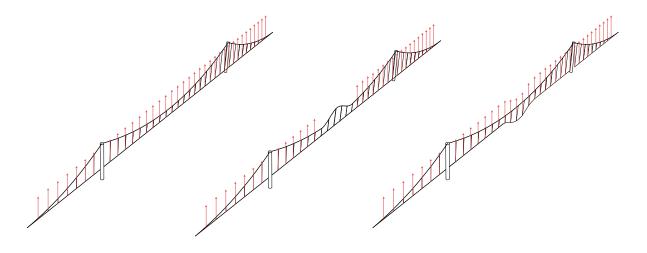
Suspension bridge, left: Each hanger carrying corresponding part of the bridge deck. middle: Suspension cable with incorrect length. right: Bridge where the suspension cable found a new shape and the bridge deck under more stress.
